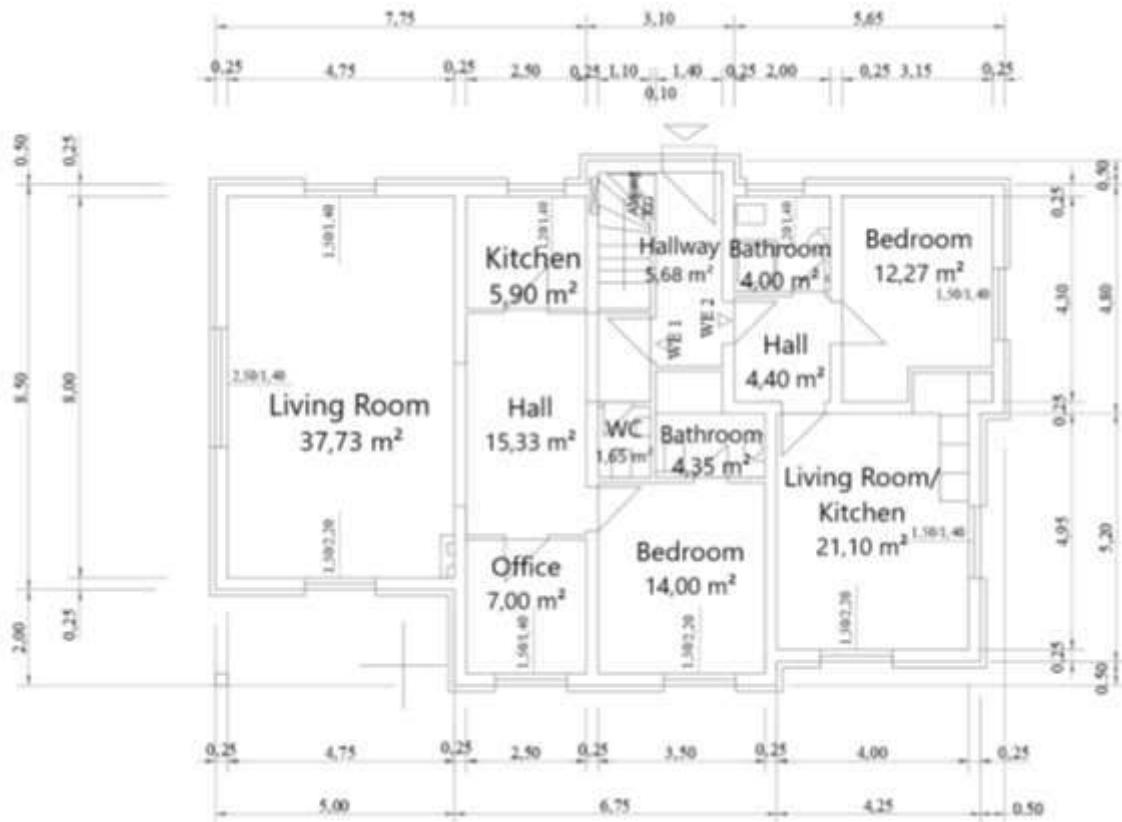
Ground Floor Plan of the House in Kitzbühel (Manzl, 2020).
